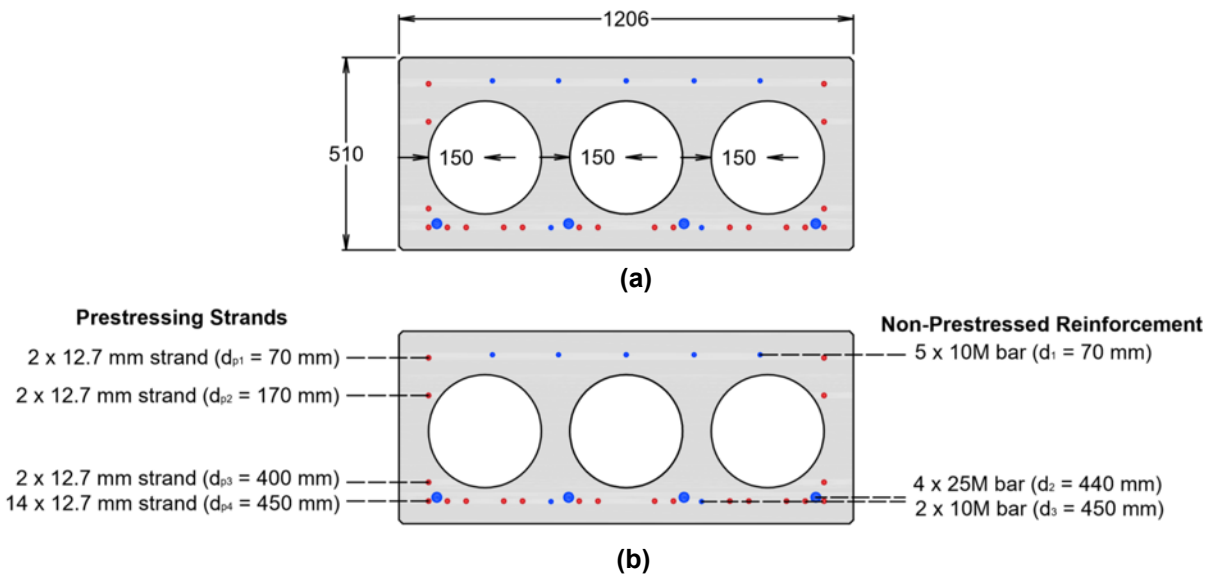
7: Cross section of test girders showing (a) general geometry and (b) reinforcement details. Stirrups not shown for clarity. All dimensions in mm.
